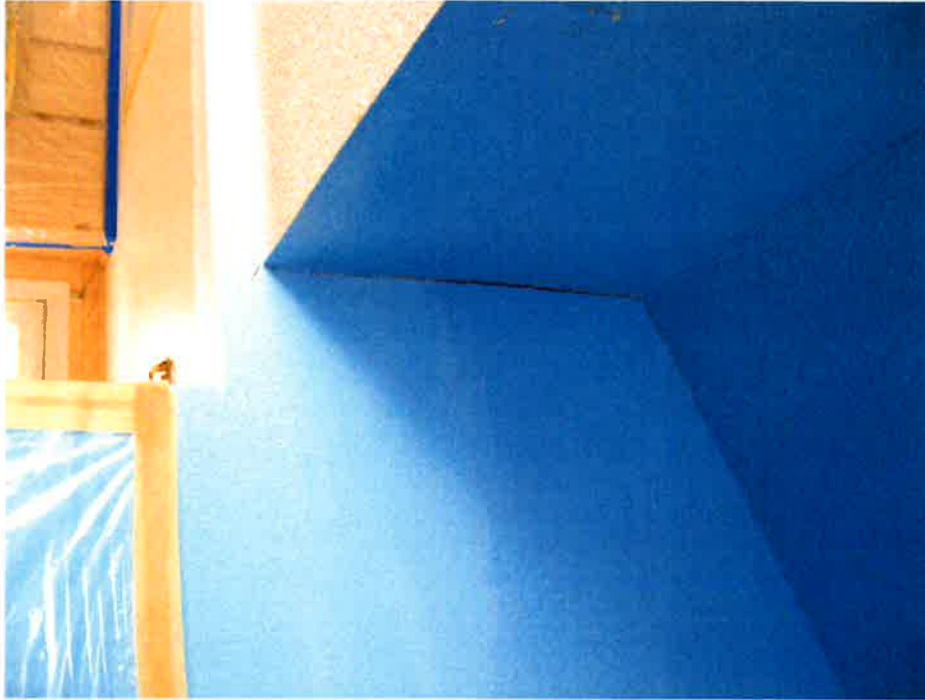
Wall separation from Pressure Grouting re-leveling of building
